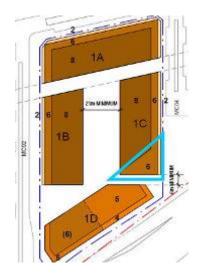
The proposed building height in storeys. Two height controls apply. The Building 1C proposes 6 storeys in the 5 storey zone, shown boxed.
